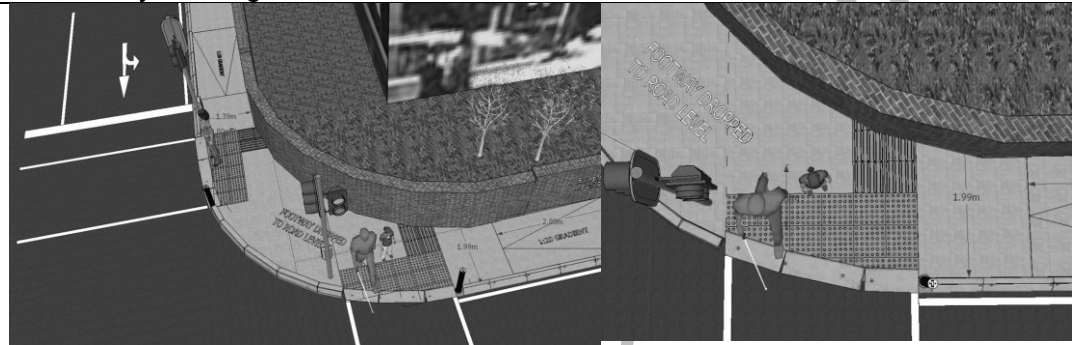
Layouts on controlled intersection with constrained space showing the entire sidewalk lowered
